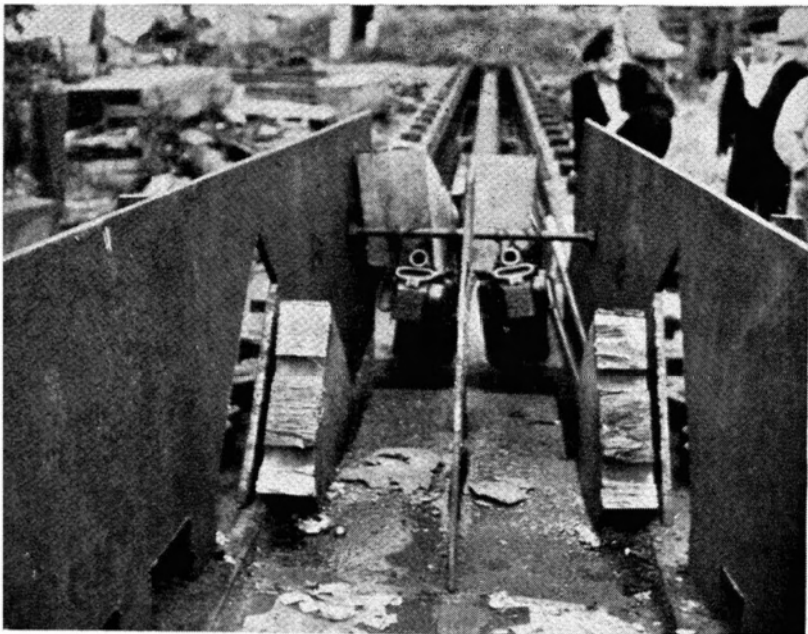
THE ANCHORAGE PLATES AFTER CUTTING
